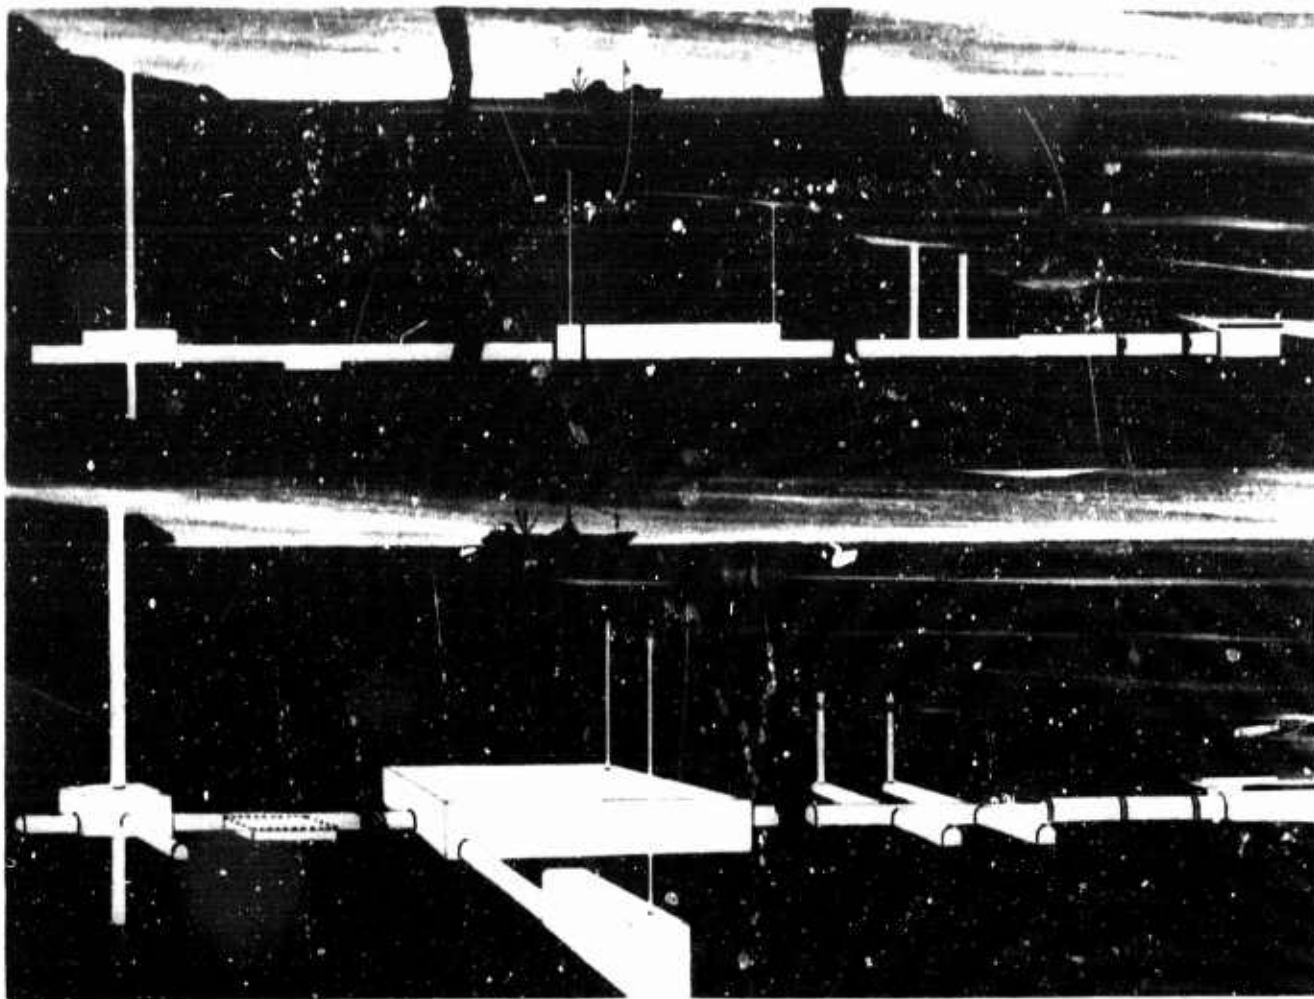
Original Design Concept for Rock Site I Consisting of Access Shaft, Power Plant, Laboratory Area, and Lock Structures.
